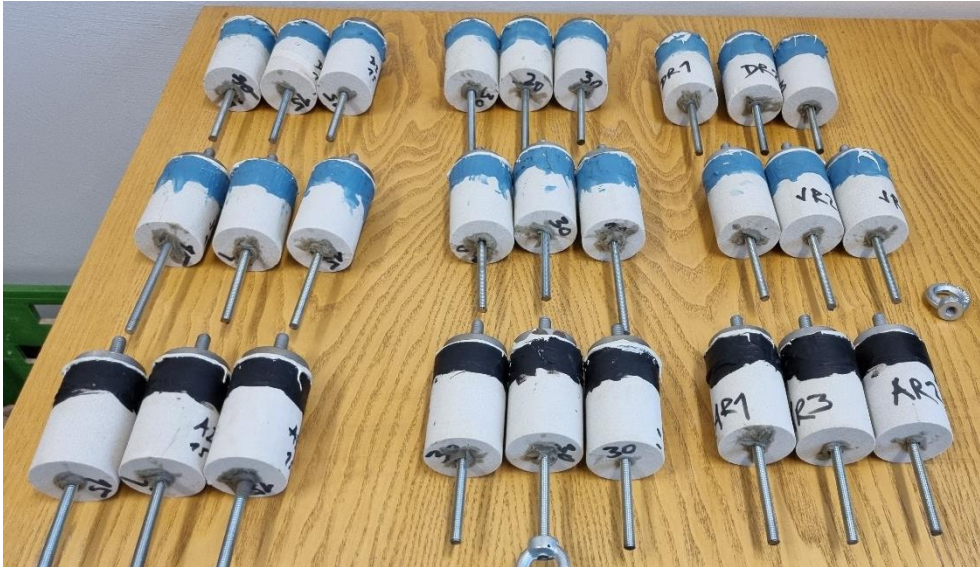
Assembly of all test specimens with glued threaded rods (sandstone).
